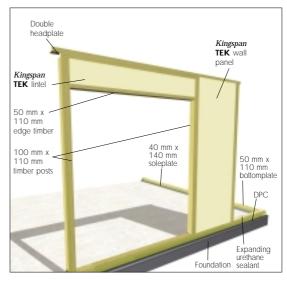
BEAMS OR LINTELS ABOVE WINDOW AND DOOR OPENINGS – CROSS SECTION
